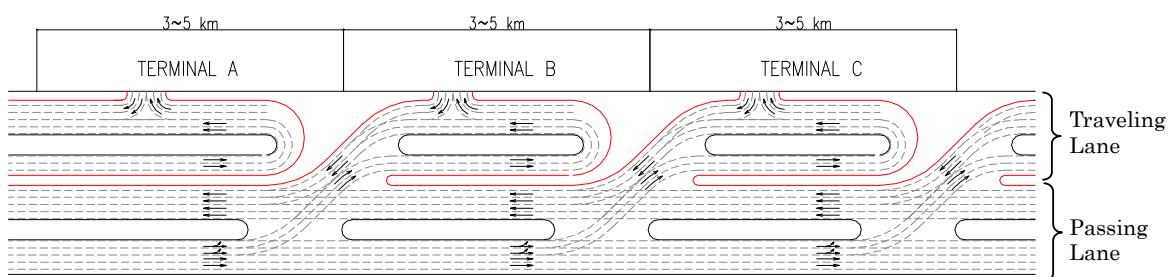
Layout of Traveling Lane and Passing Lane
